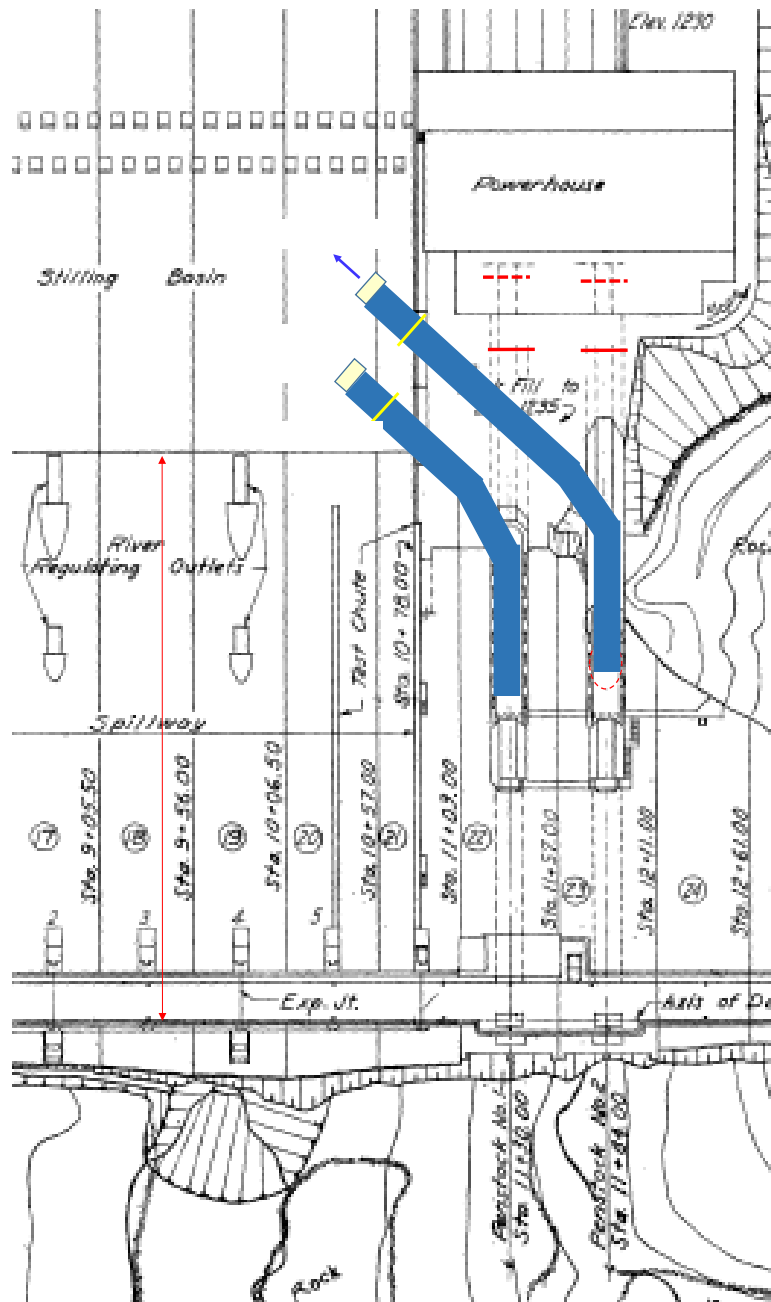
Schematic Plan Details of the RO – Penstock Bifurcation Conduit
